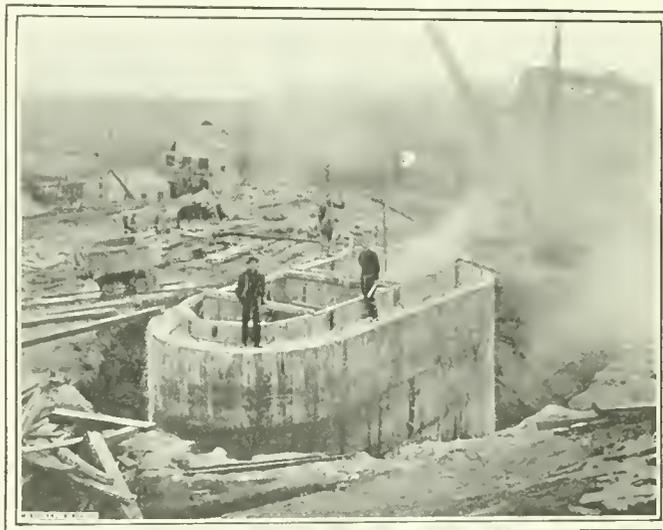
VENTILATING SHAFT, CONCRETE IN PLACE BEFORE SETTLING
